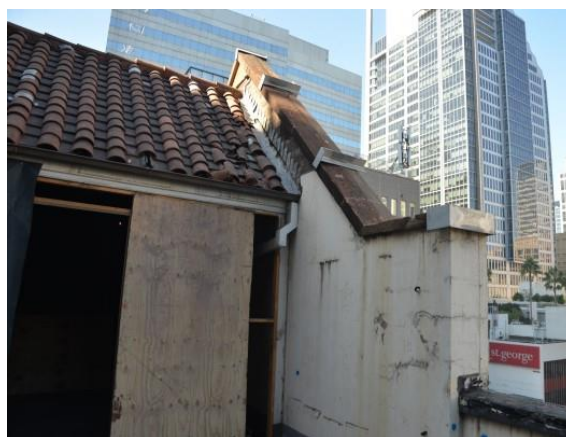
Detail of the southern parapet gable end wall to the tiled roof. (Source: GML 2018)
